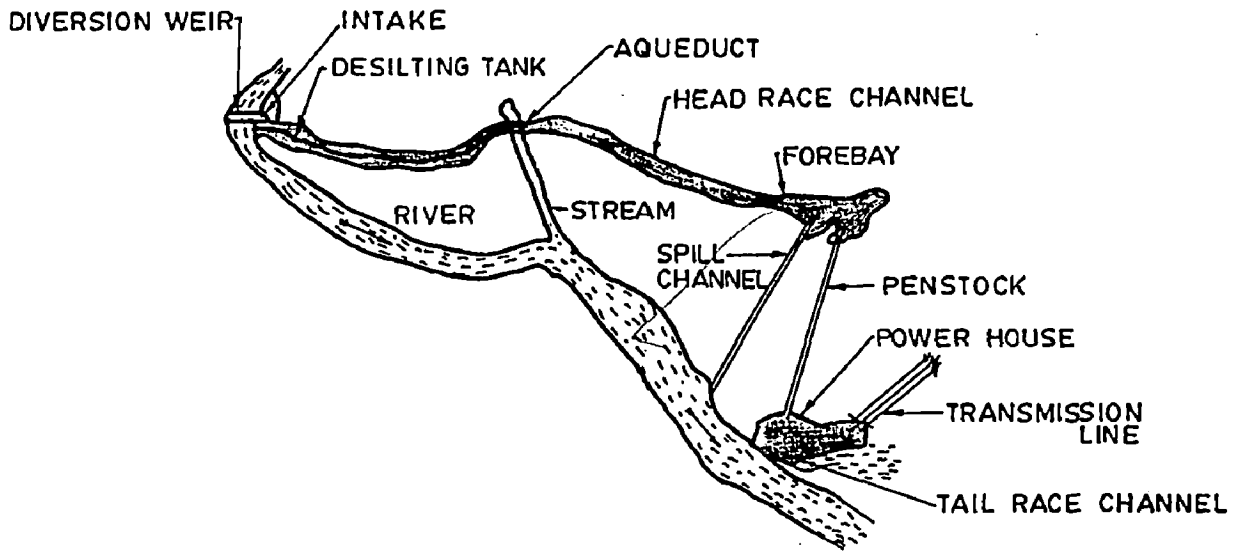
TYPICAL LAYOUT OF RUN-OF-RIVER SMALL HYDRO-POWER SCHEME
